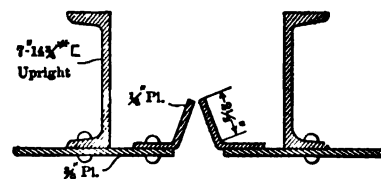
Horizontal Section through Two Adjoining Wickets.
